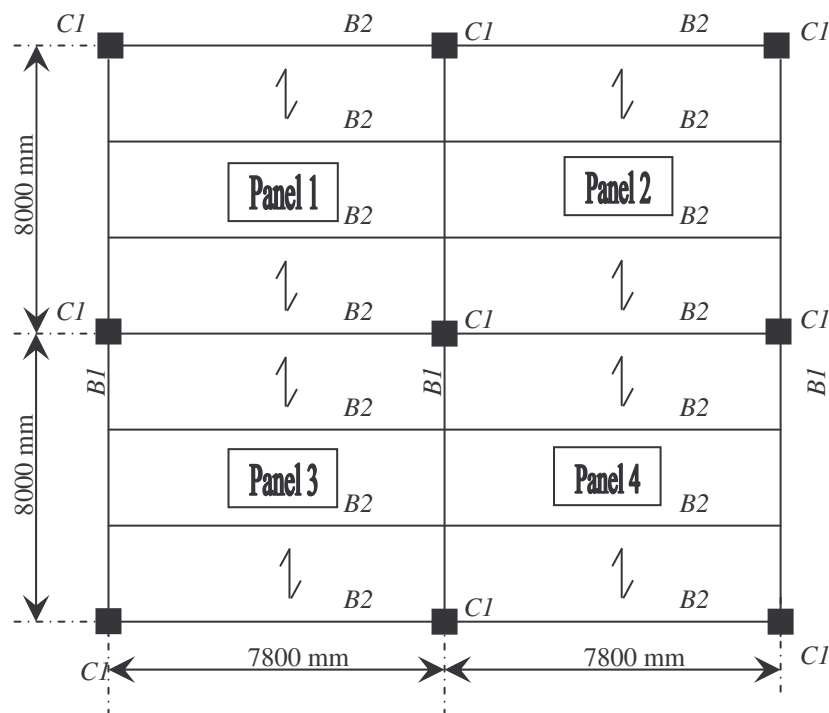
Structural configuration of the 2 x 2 steel-deck composite floor model
